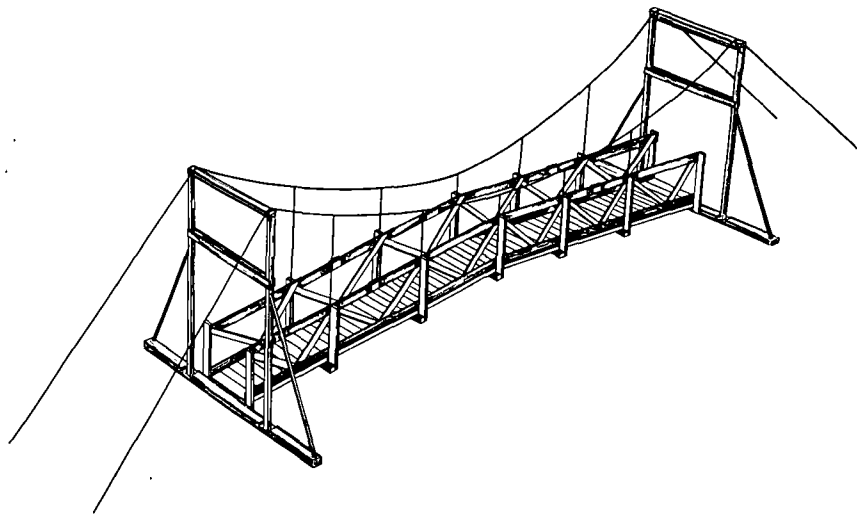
Suspension footbridge constructed of dimensioned lumber.
